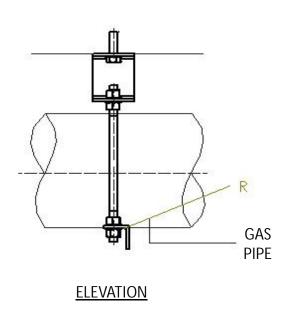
Typical Pipe Support for Horizontal Gas Pipe (F)
